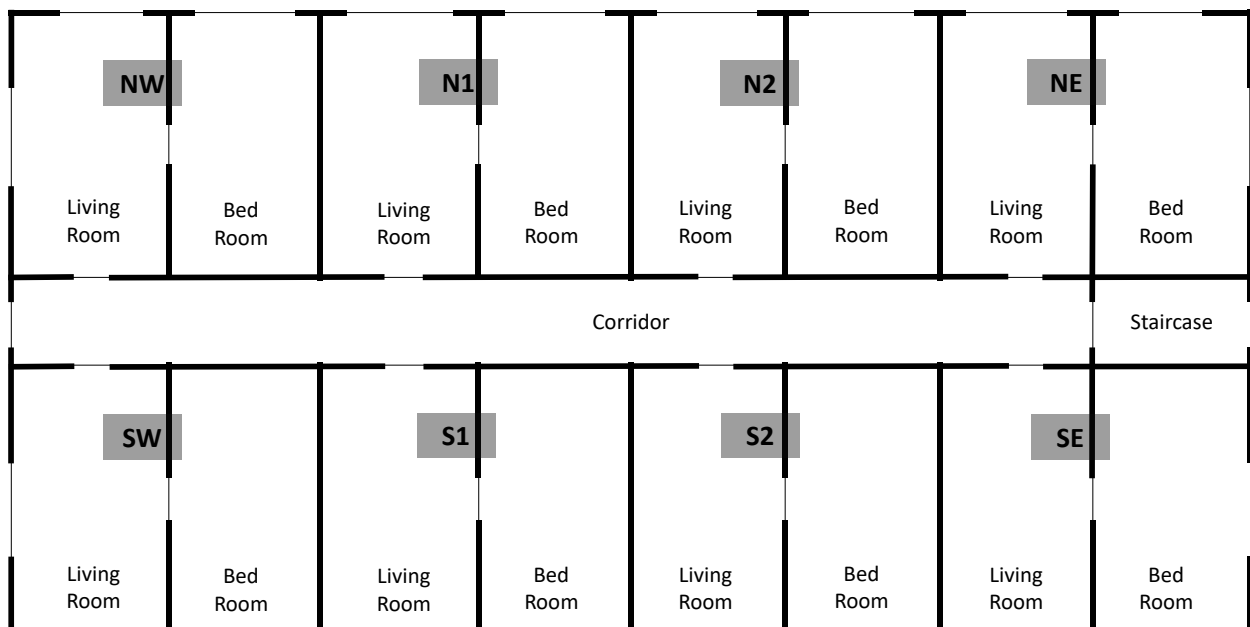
Plan view of the mid-rise MURB model with thermal zones and names of suite units.
